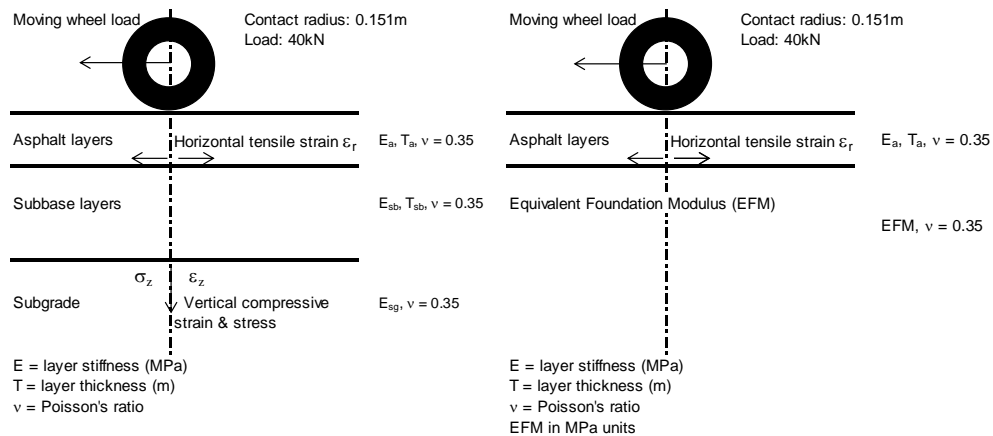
Model for 3-layer pavement structure (left) and 2-layer pavement structure (right) used in the alternative fatigue model
